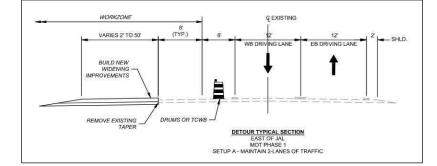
A. NM 128 MOT Typical Section – Enhanced Two-Lane Construction
